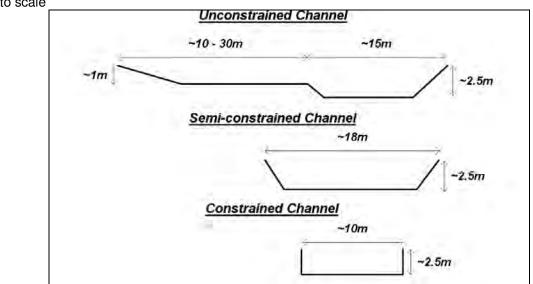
Western Conveyance Typical Channel Cross Sections (Medium)
